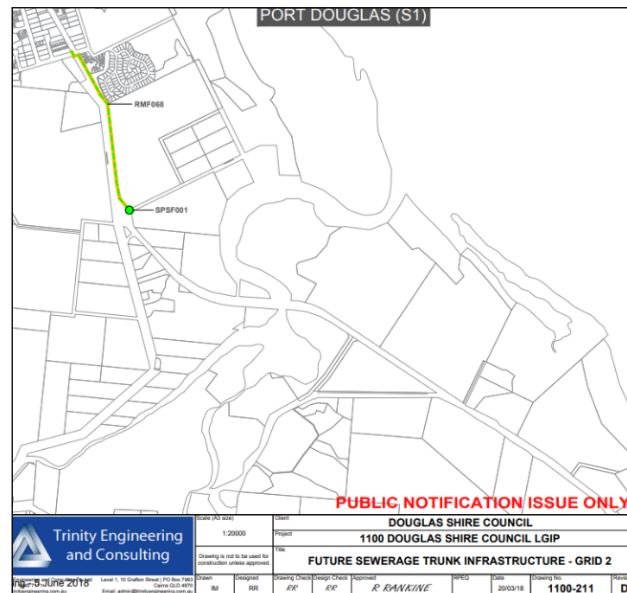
LGIP Future Sewerage Trunk Infrastructure Plan
